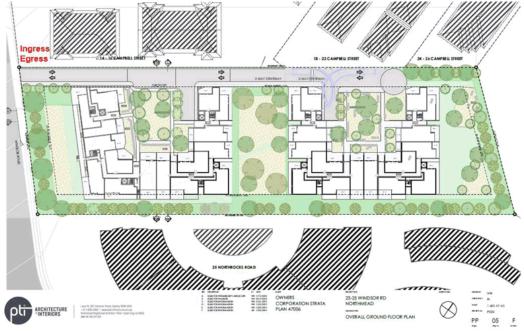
Vehicle access plan for subject site (Source: PTI Architecture)
